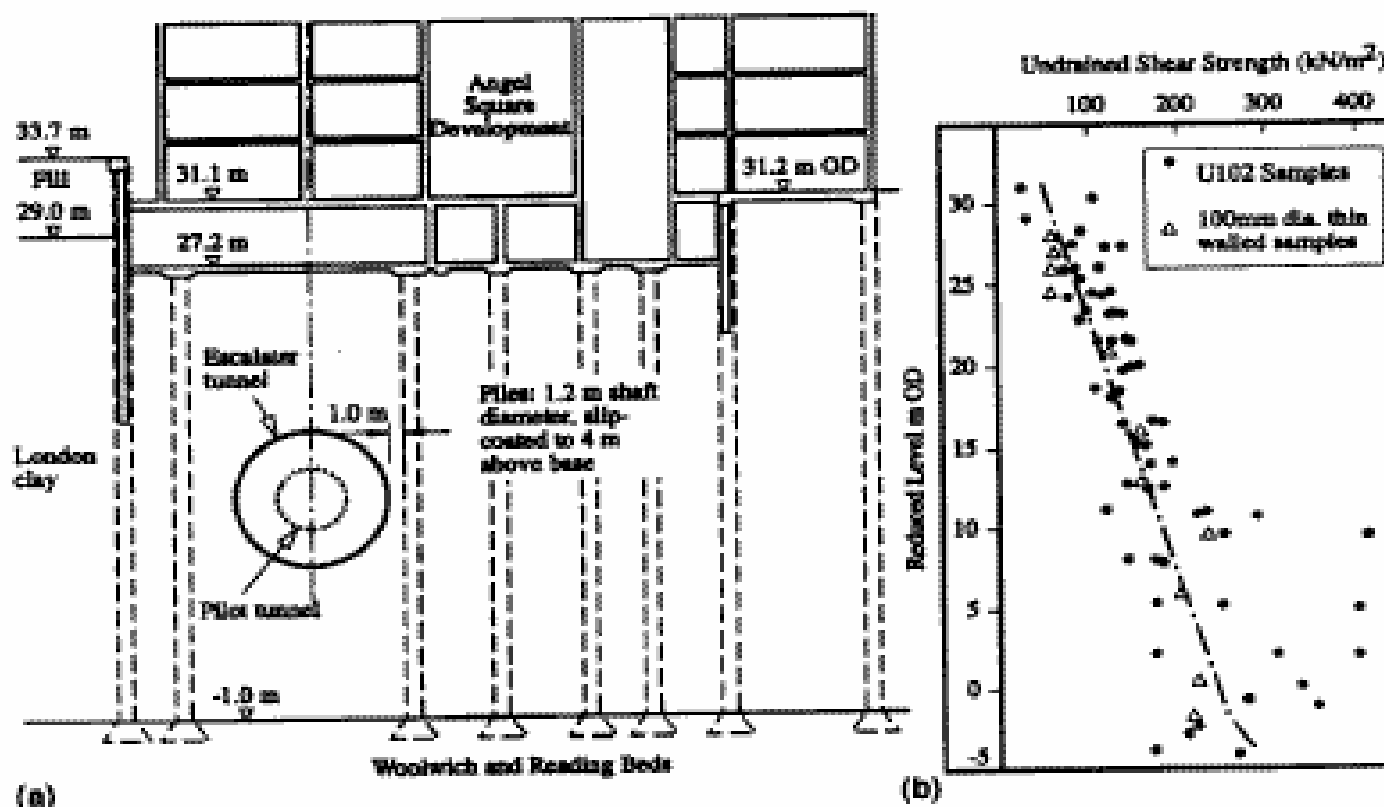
Case History Studied Tunneling for Angel Underground Station [after Mair (1993) and Lee et al. (1994)] (a) Section through Angel Escalator Tunnel and Building Foundations; (b) Undrained Shear Strength
